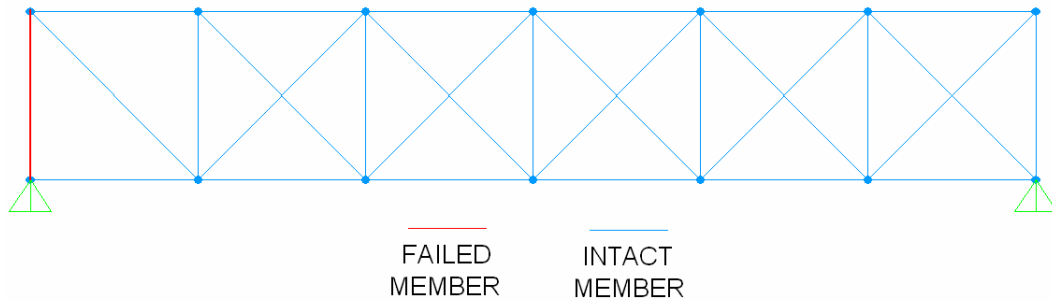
Truss Failure Due to Member Removal Location
